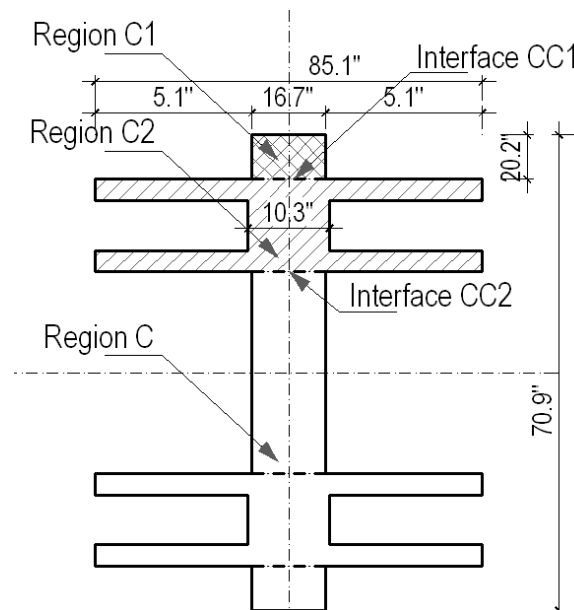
Homogenized equivalent concrete section bs – Example 2
